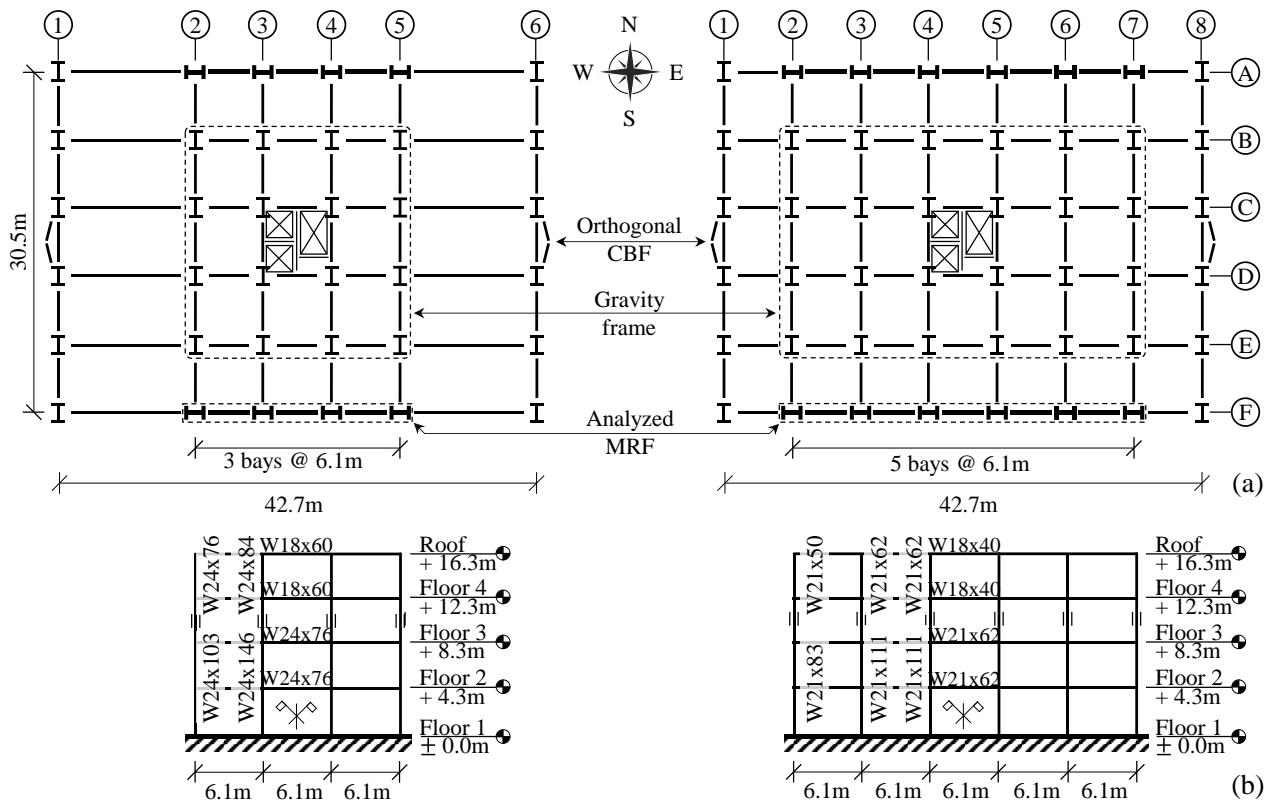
Three- and five-bay, four-story steel buildings: (a) typical plan views; and (b) elevation views of the analyzed MRFs.
